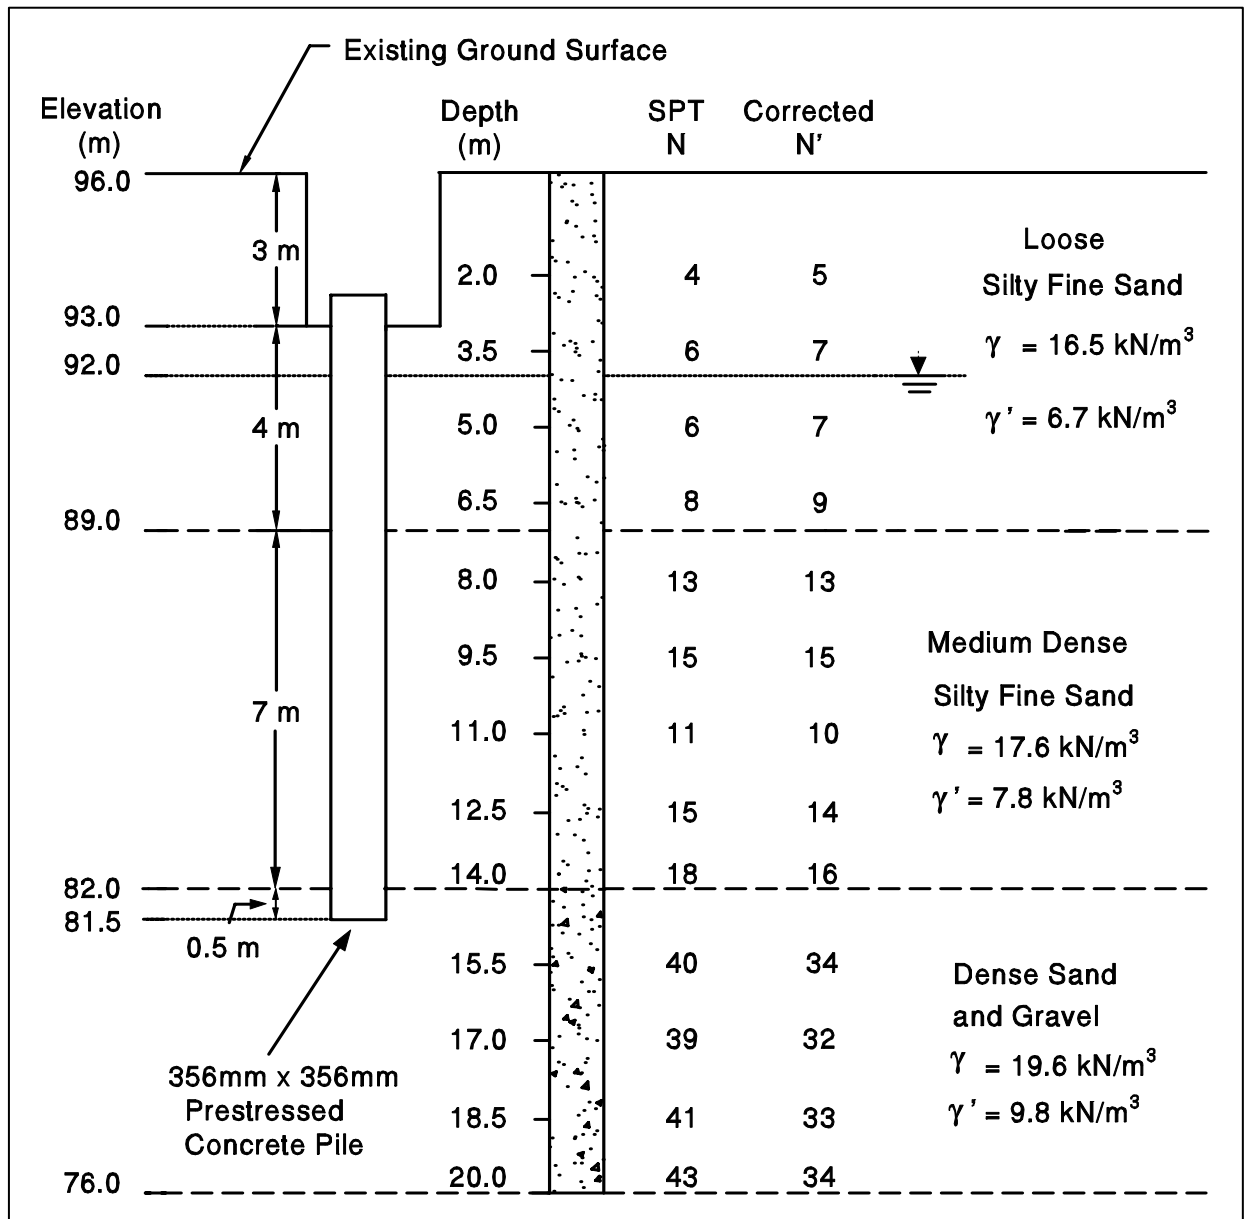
Interpreted Soil Profile from Soil Boring S-1 at the North Abutment
